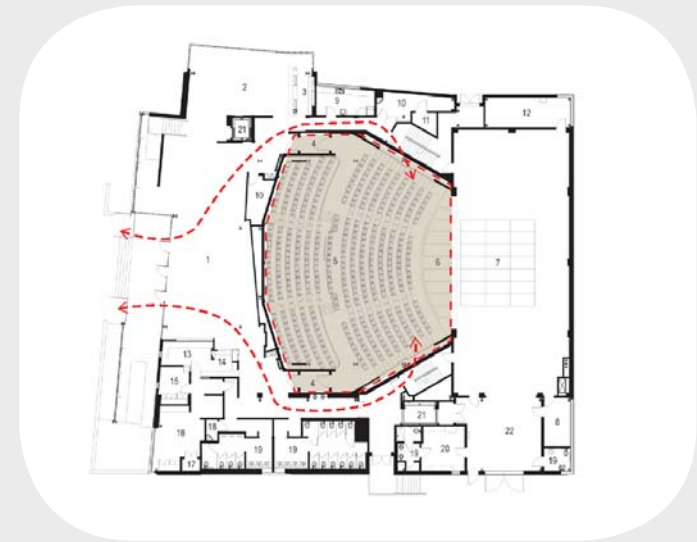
08 : Topfer Theatre, Ground Floor Floor
